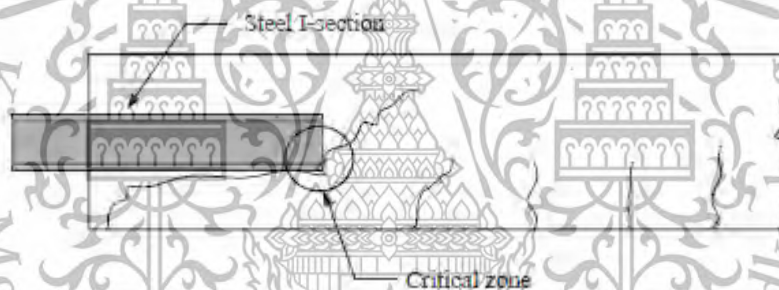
Failure characteristics of precast reinforced concrete beams with I-shaped steel embedded in the support. [10]
